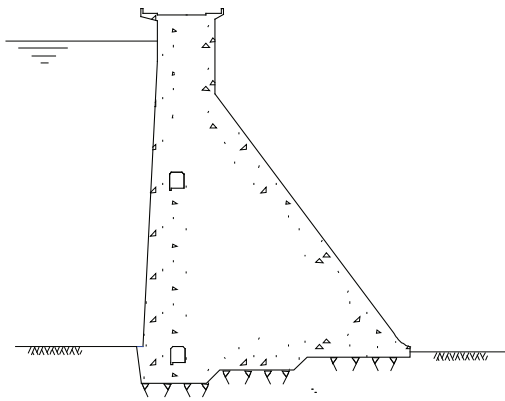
Typical cross-section of a conventional concrete dam.
